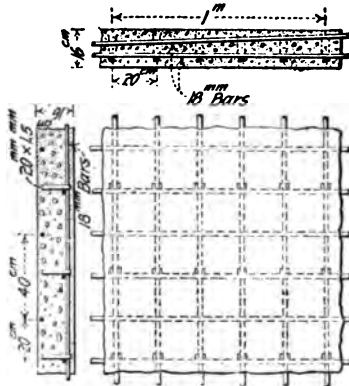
Hennebique Floor Slab with Double Reinforcement.
